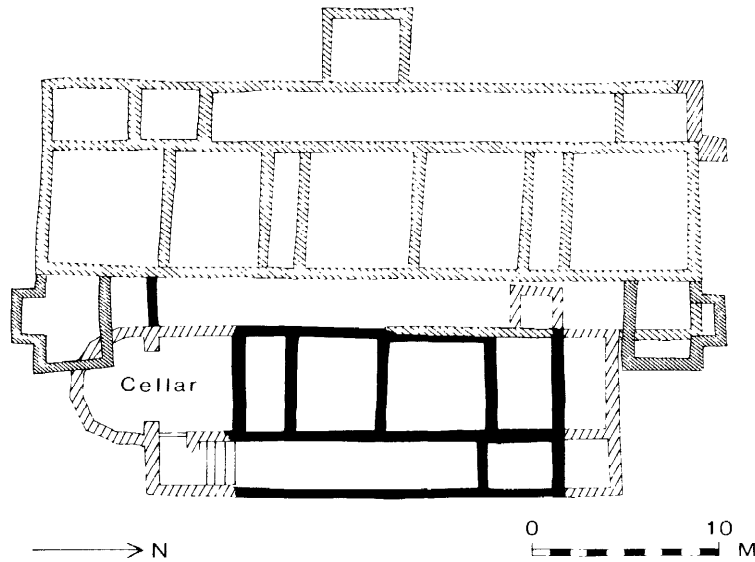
Gorhambury villa, Herts. Groundplan of Building 27 (D S Neal)
